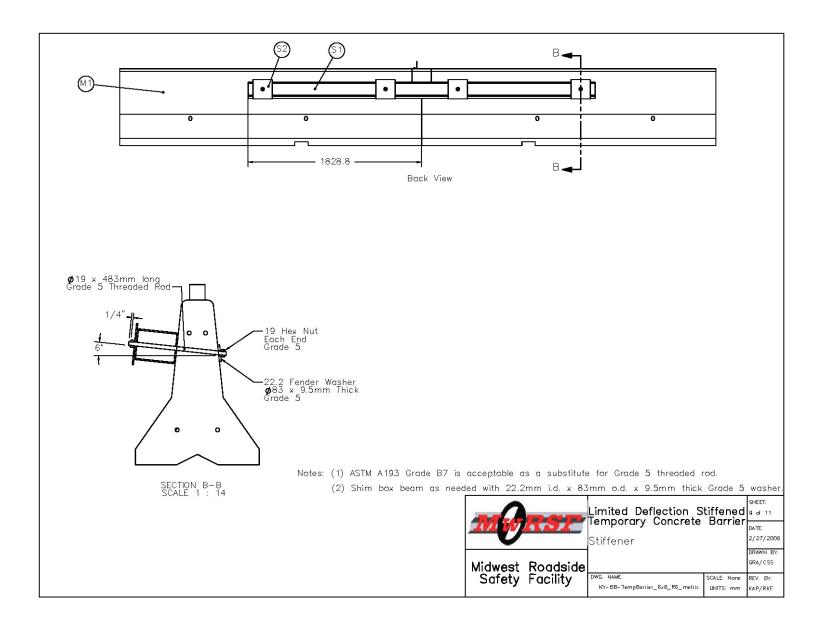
Box Beam Stiffener Details, Test NYTCB-3
